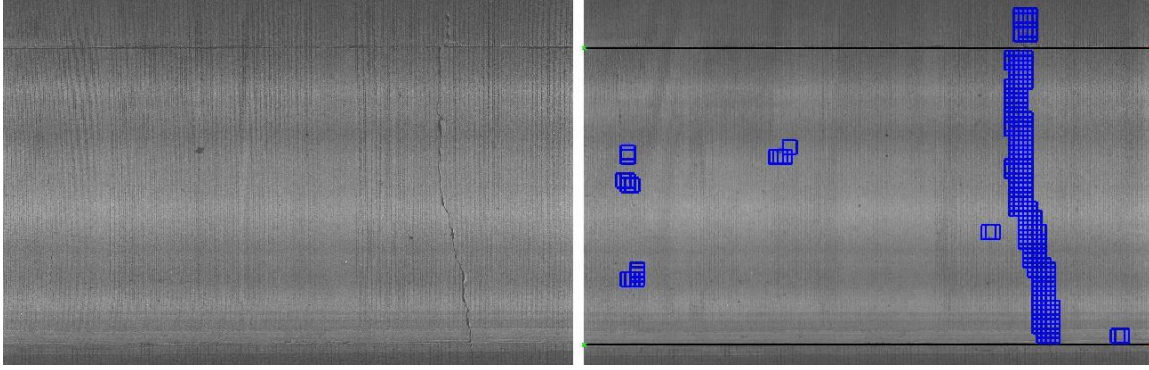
Example 3 of concrete cracks at high and low severities: raw crack (left) and crack detection (right)
